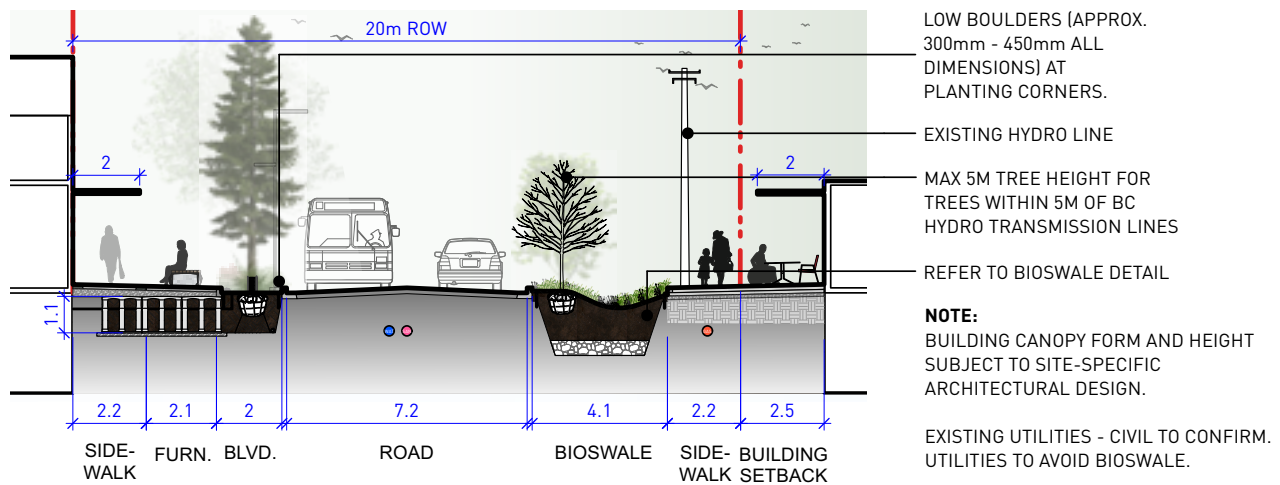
SECTION 1 - TYPICAL STREETSCAPE
